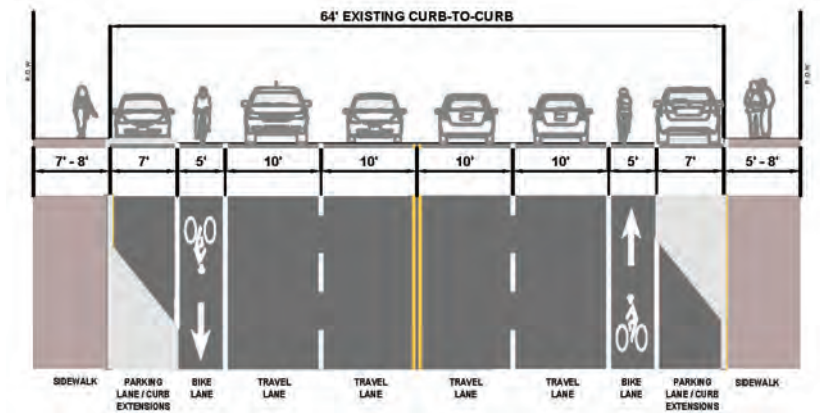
Industrial Road Existing Typical Section D (Facing North)
